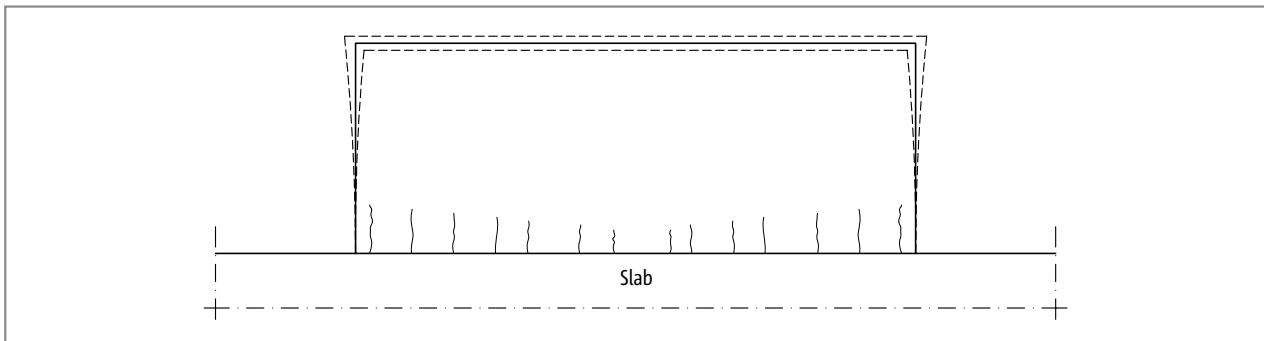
Balcony slab without Schöck Isokorb®: Crack formation through fatigue possible
